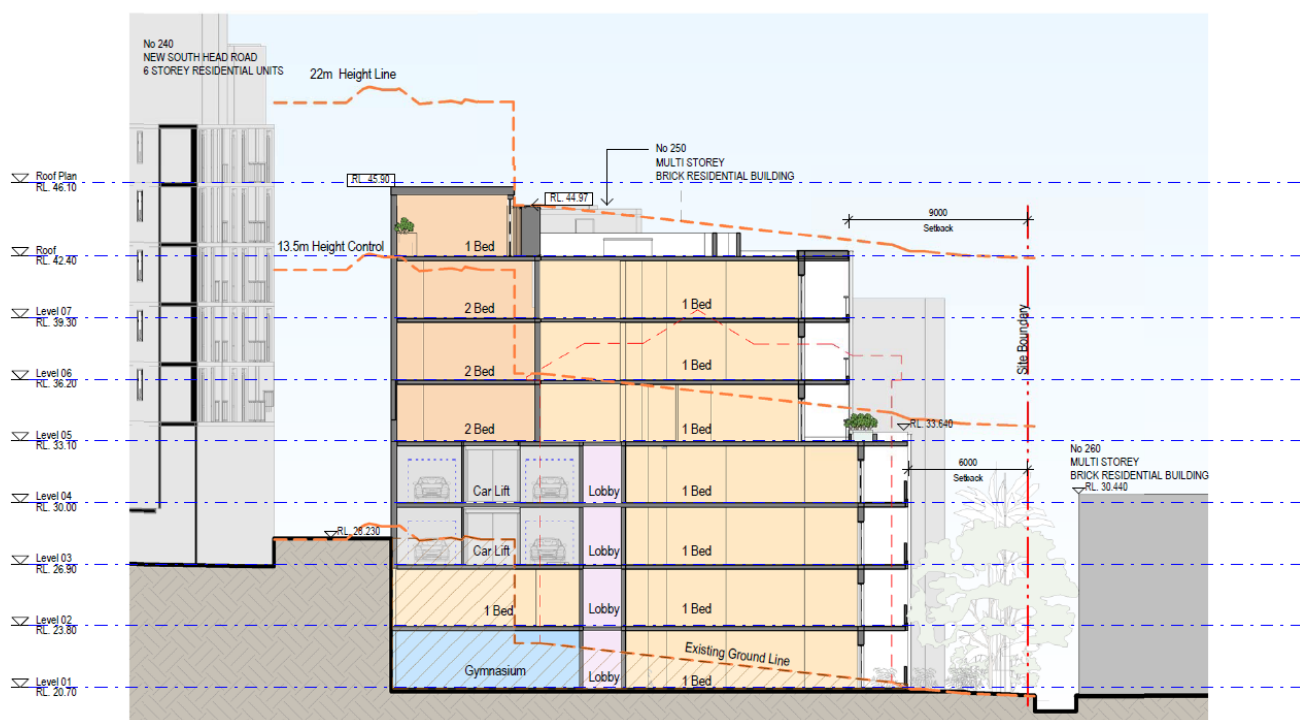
Cross-section of the concept scheme (Source: Architectural drawing set).
